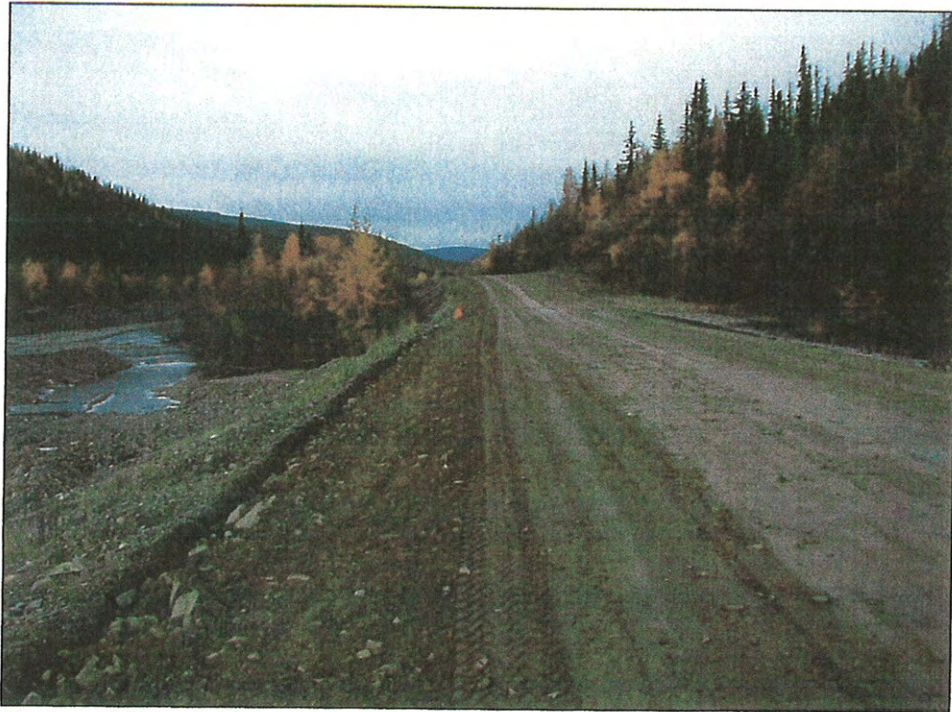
View looking west from the Taylor Highway with Wade Creek in the background. (9/12/02).
